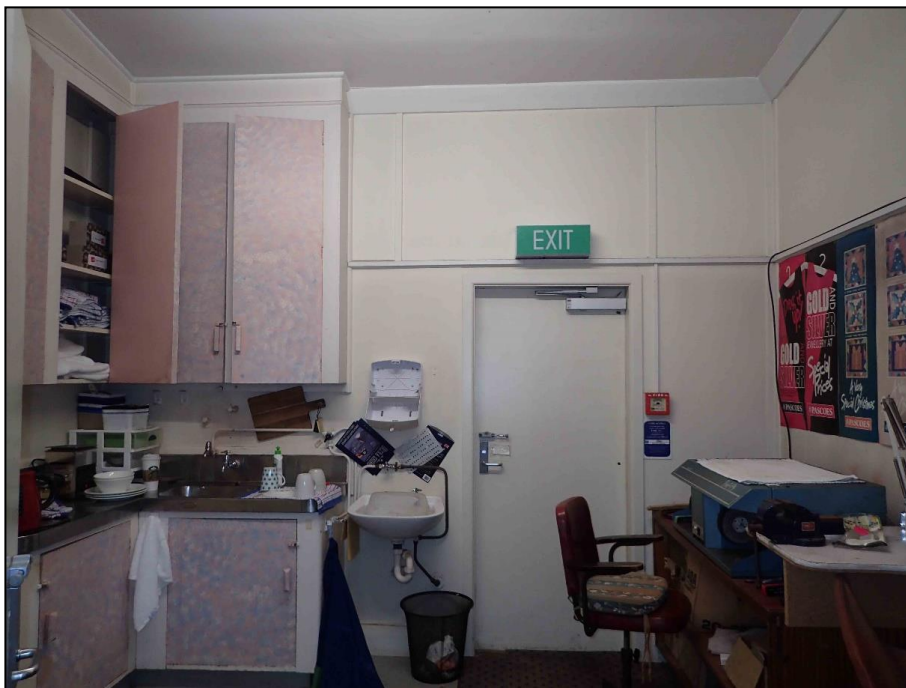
Pascoes staff room (Room 2), facing south. Note bevelled architraves.
